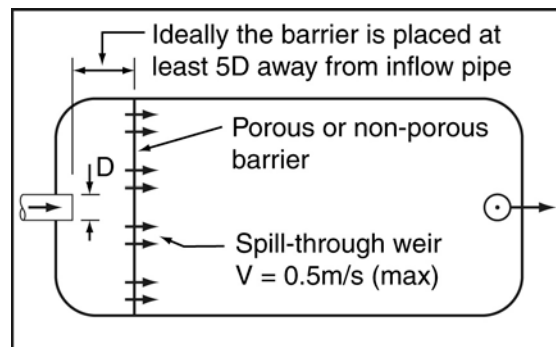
(b) – Typical layout of inlet chamber with opposing inlet pipe (Type C basin)
